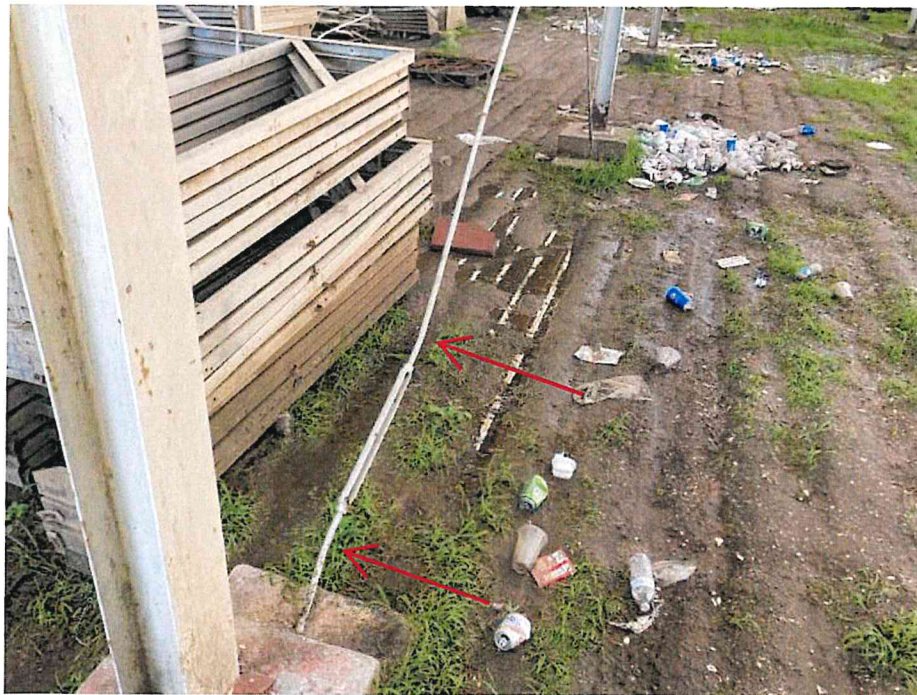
Close-up photo showing bent/damaged cross-bracing rods
